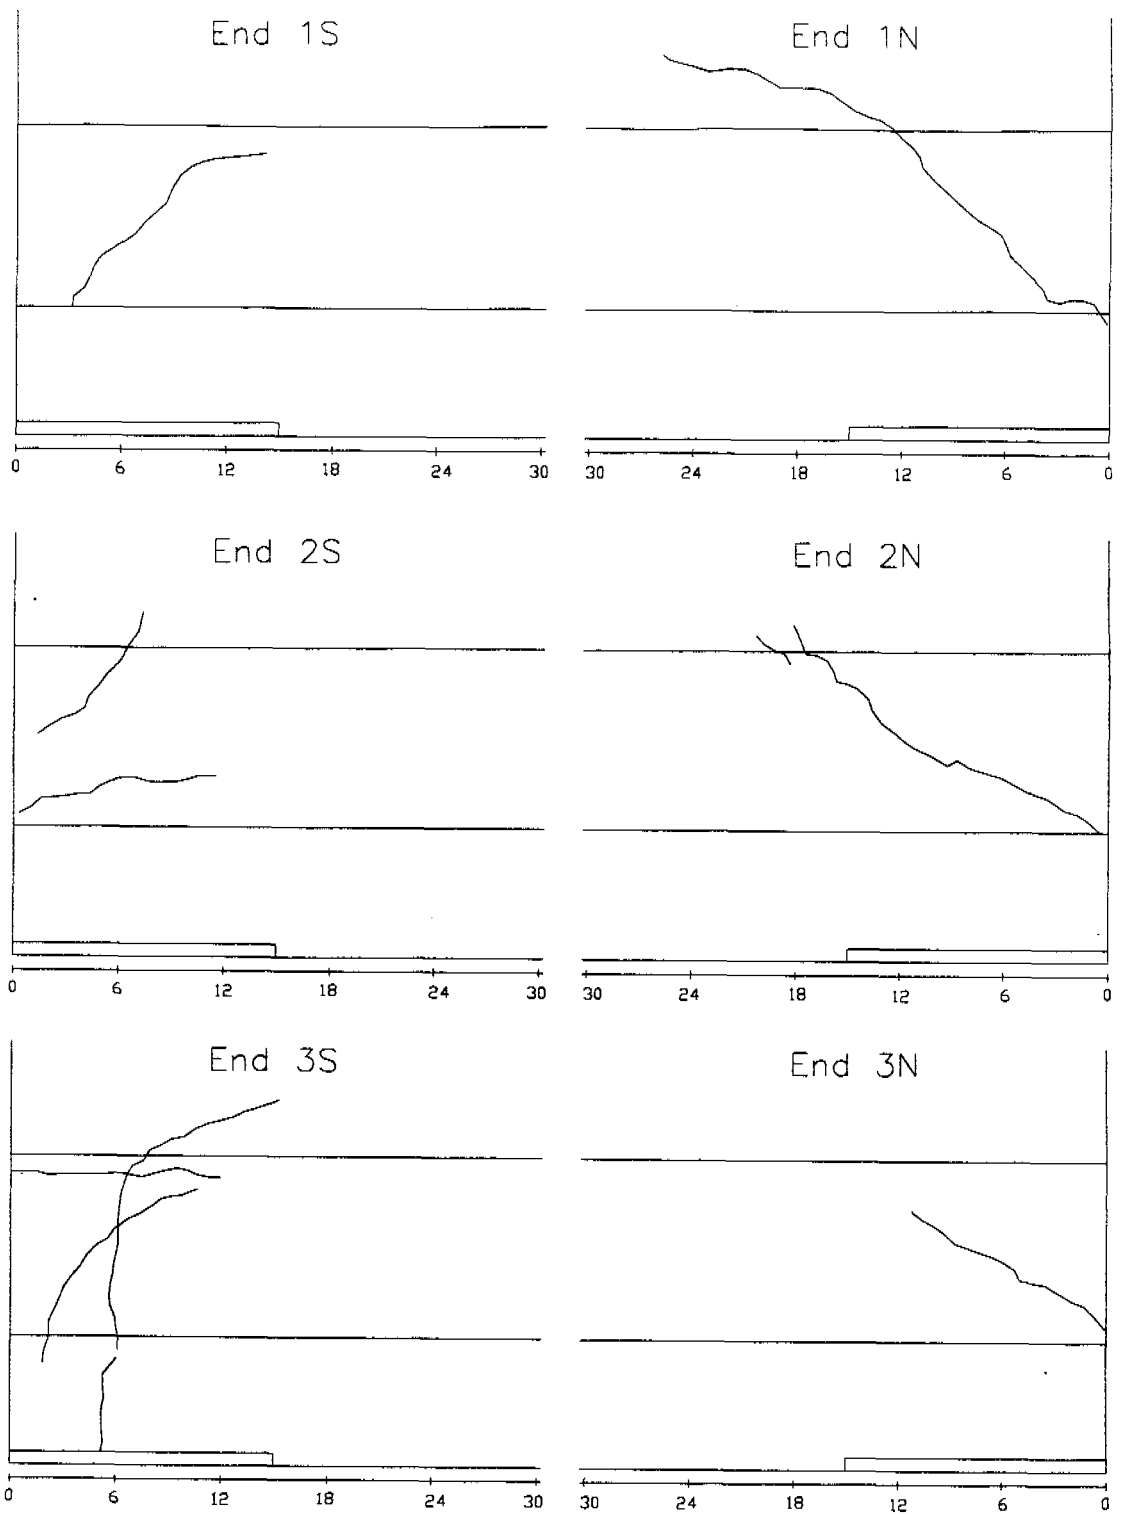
Survey Form for 63 in. Girders, 8-11-95
